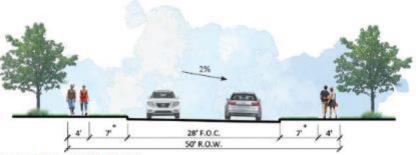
Typical Neighborhood Street (50' Right-of-Way) NOTE: Cross slope or crowned roadways may be utilized.
